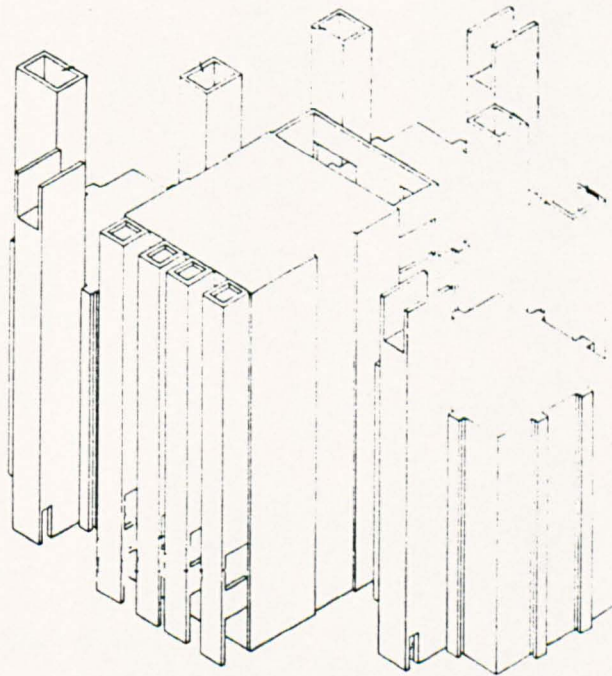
Richards Medical Research Building stair towers, vertical slabs.
